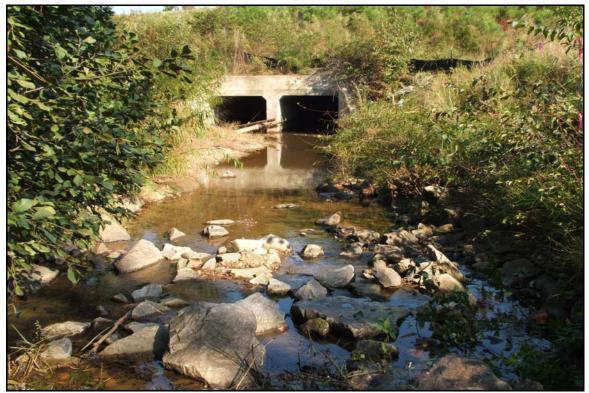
(Reach 1) – View looking downstream with culvert under Collector Rd. in center of photo.
